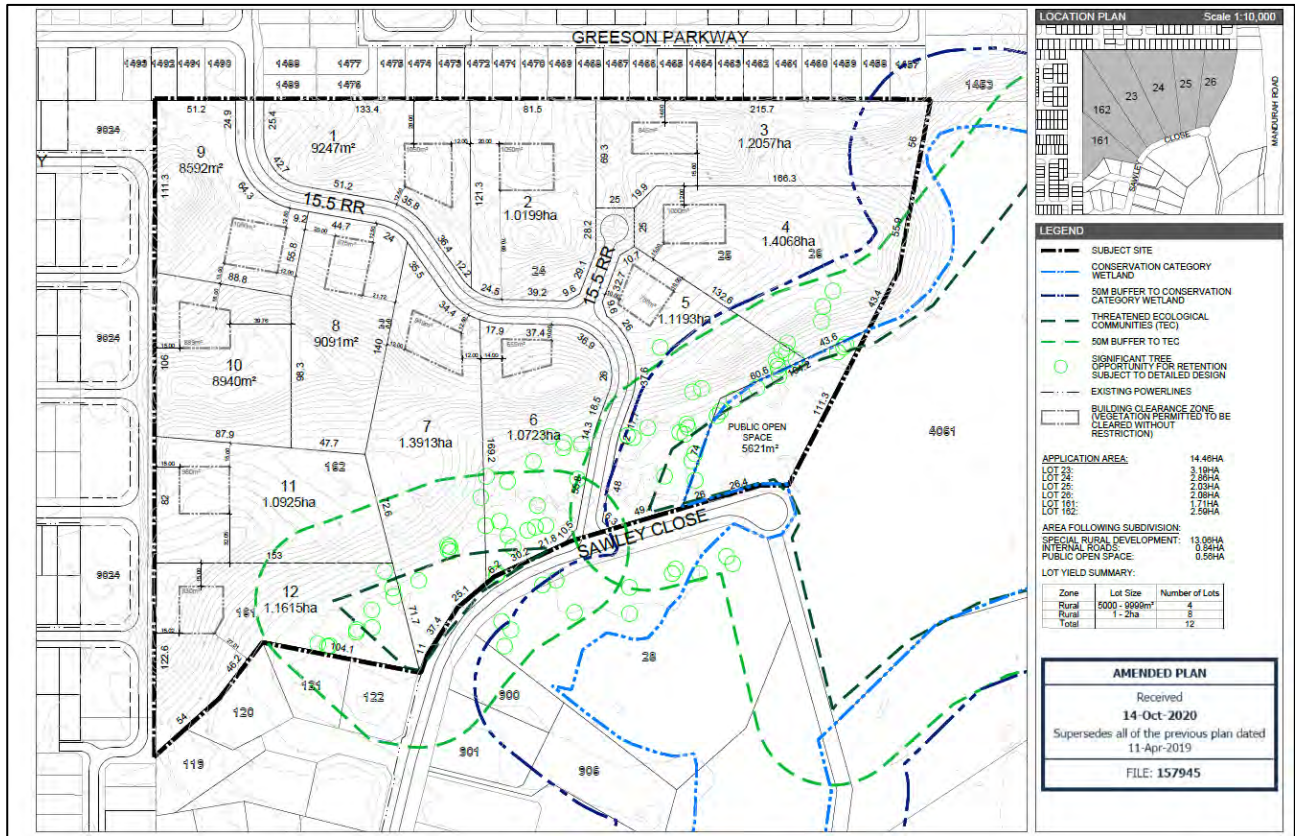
Approved plan of subdivision (WAPC Application No. 157945)
